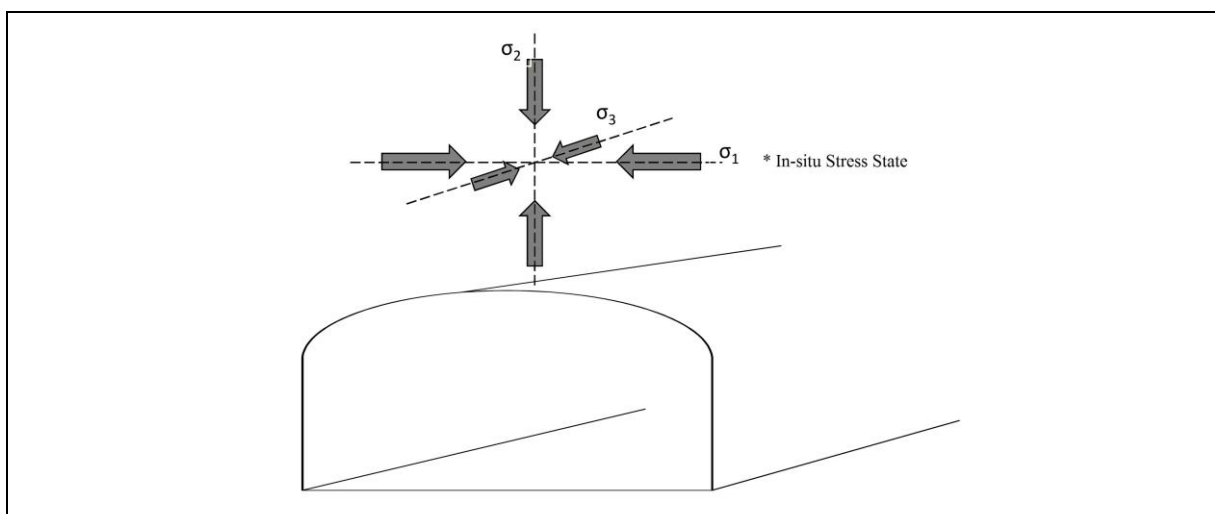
Large Span Cavern Needs Greater Roof Stability
